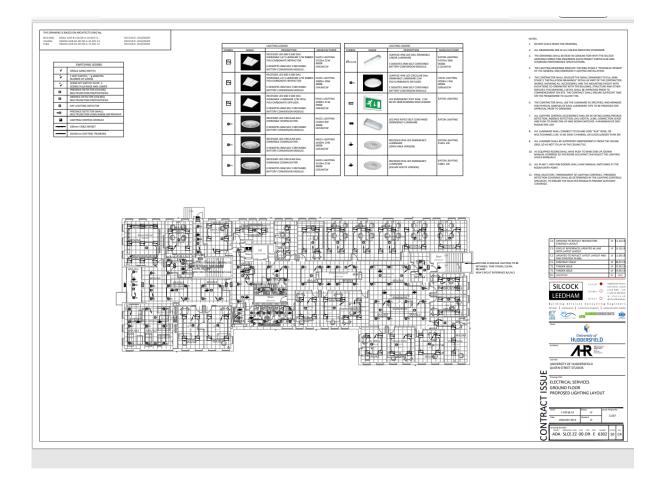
Electrical Services Ground Floor Proposed Lighting Layout (Percy Shaw House Building).
